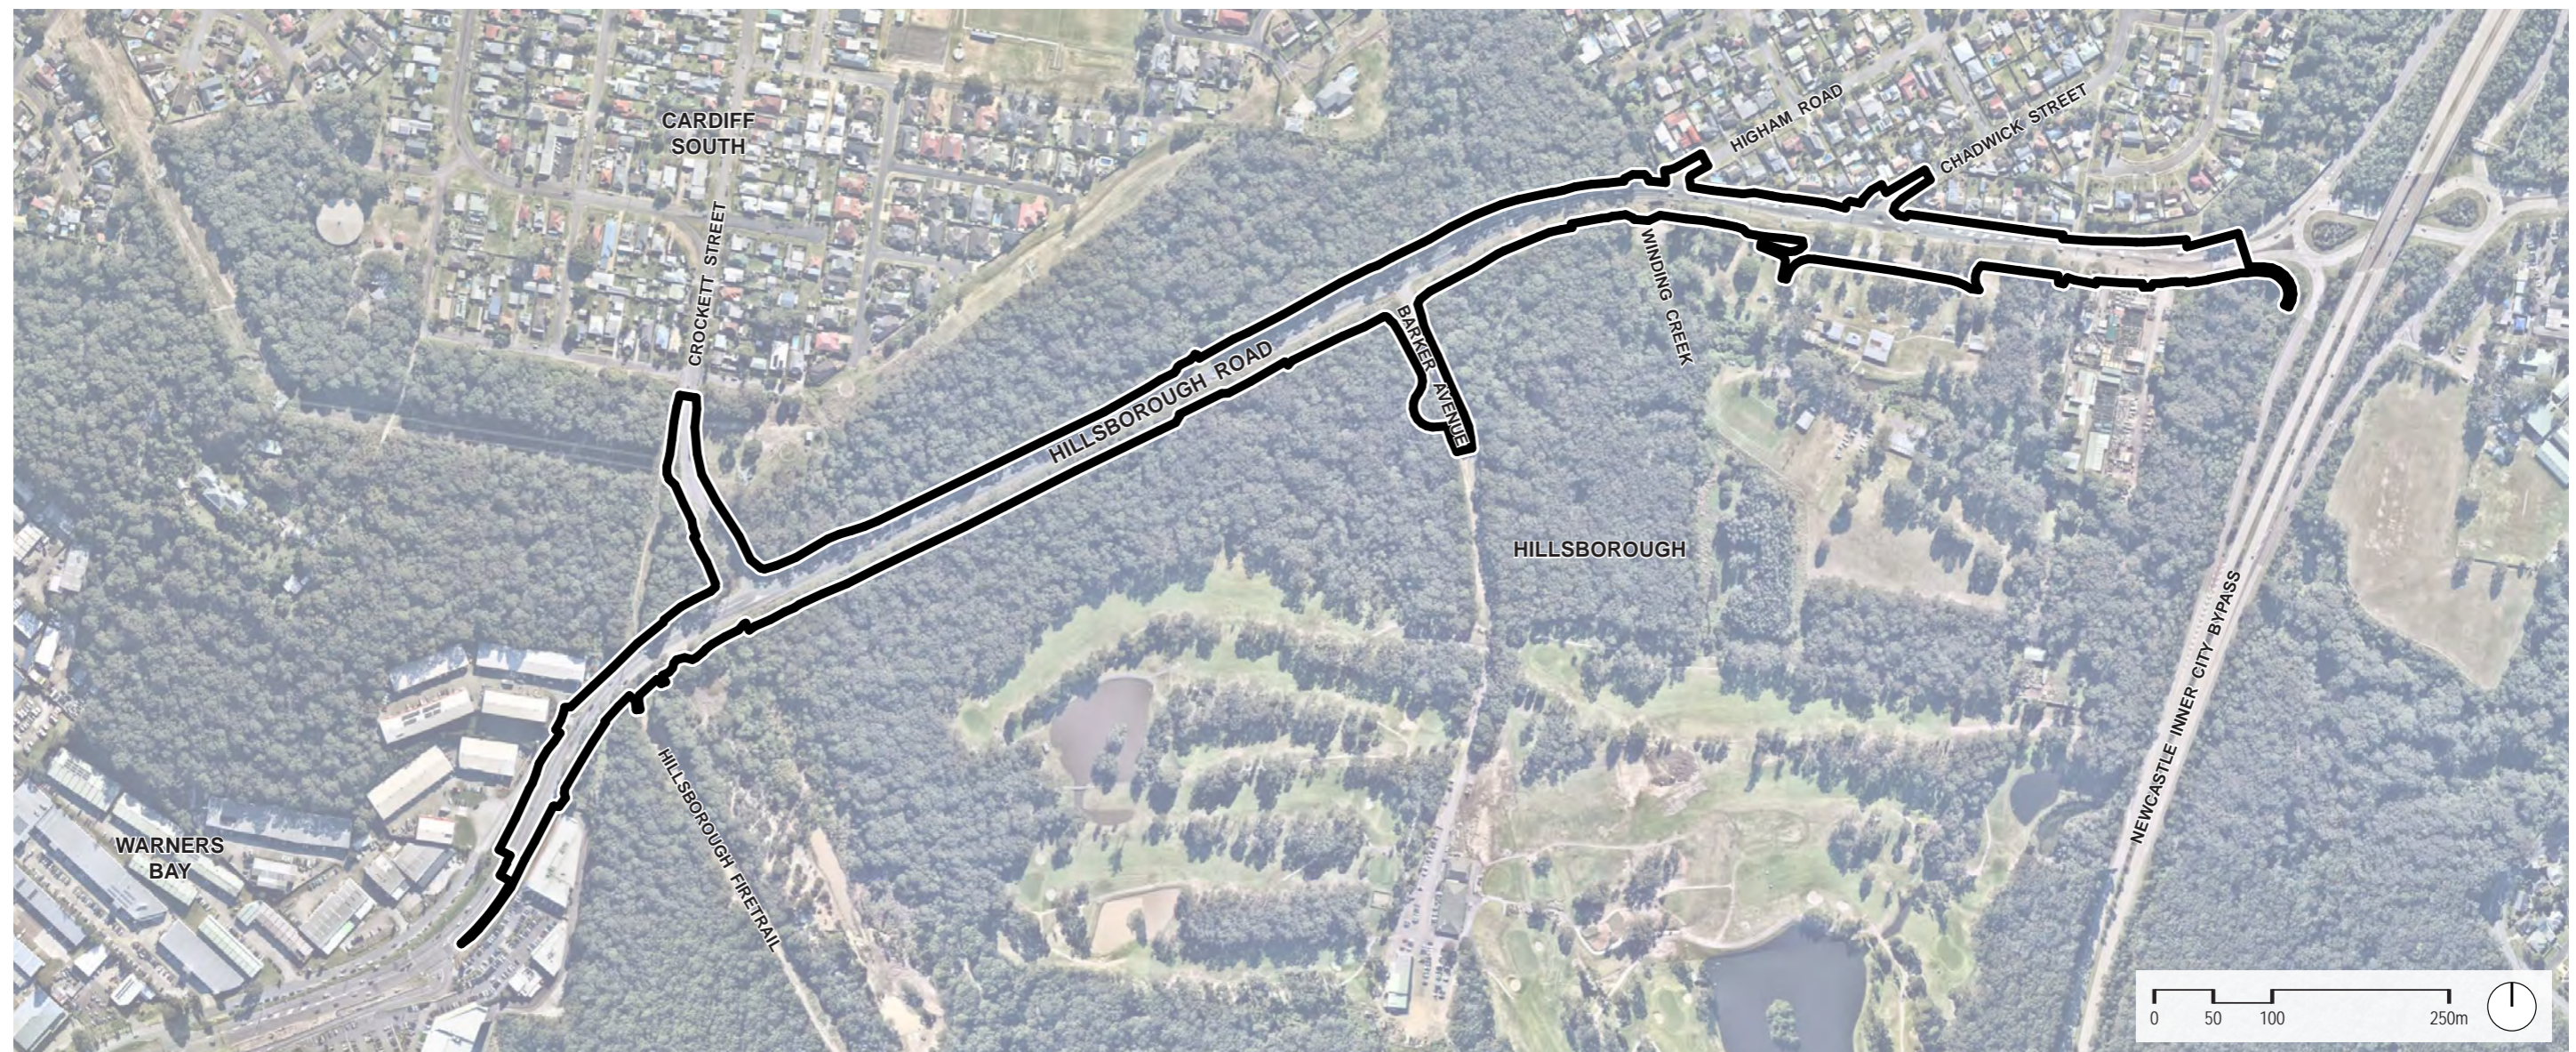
Hillsborough Road - Extent of proposal - Newcastle Inner City Bypass to west of Crockett Street
